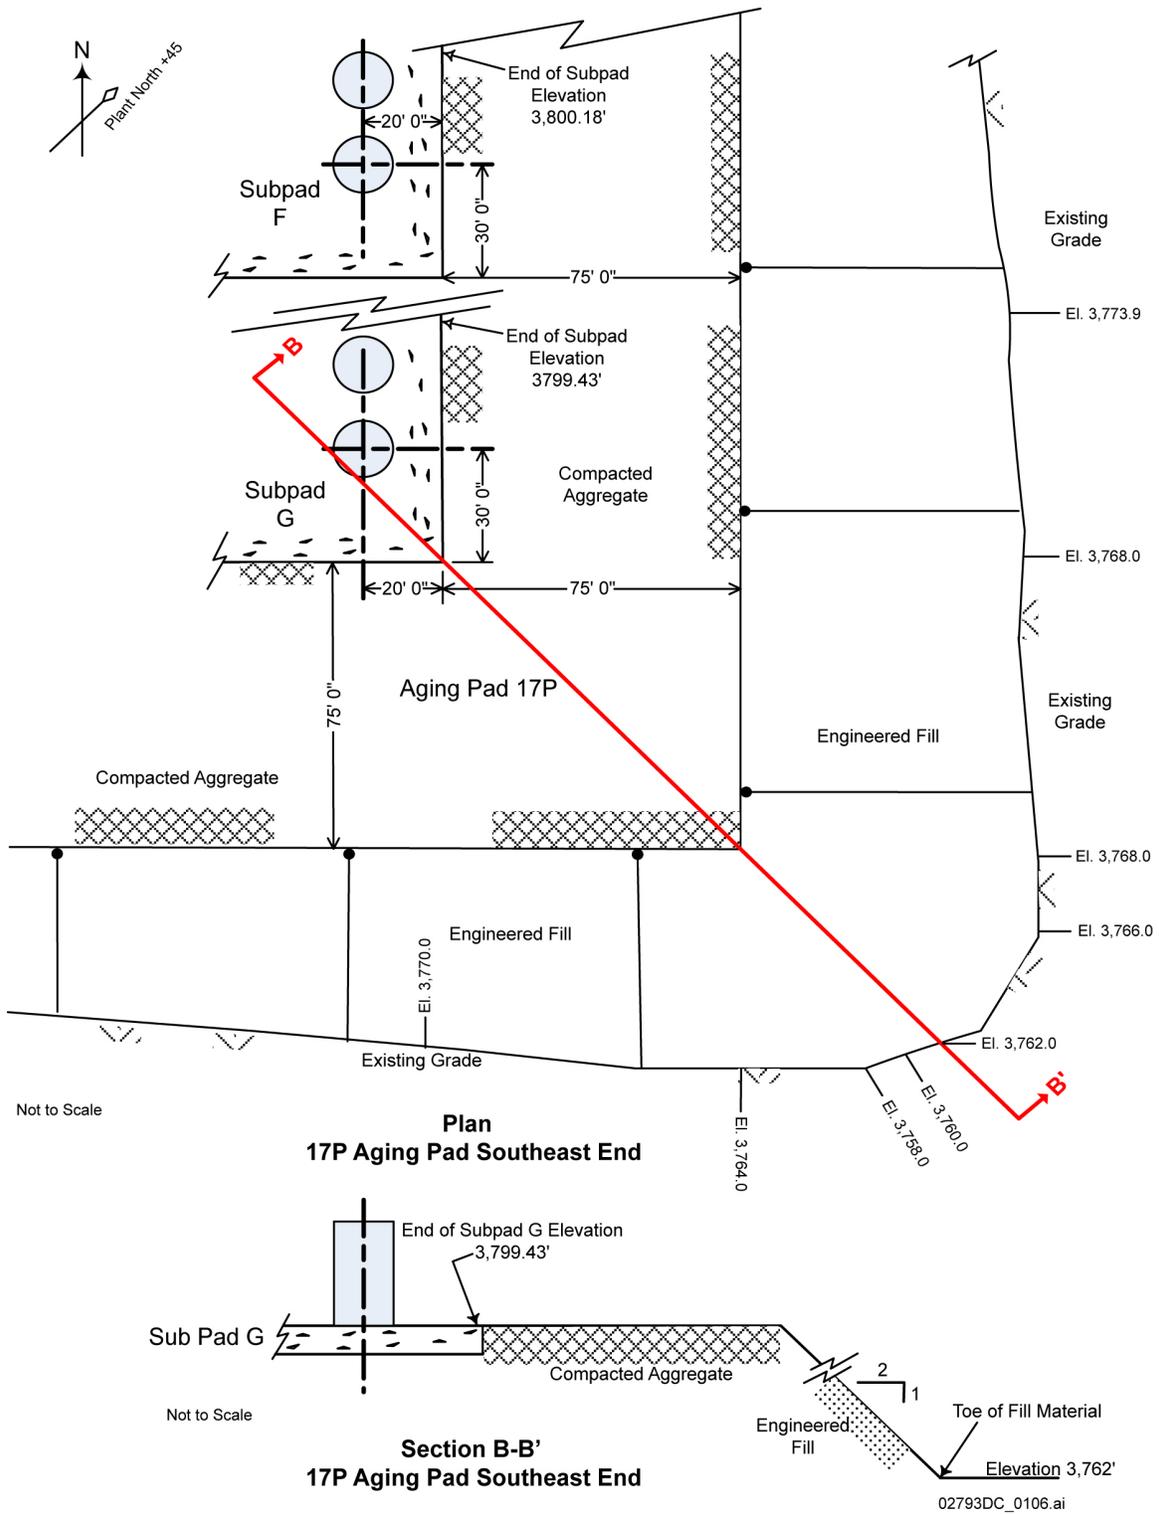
Aging Pad Partial Plan and Section Showing Fill Slopes, Southeast Corner
